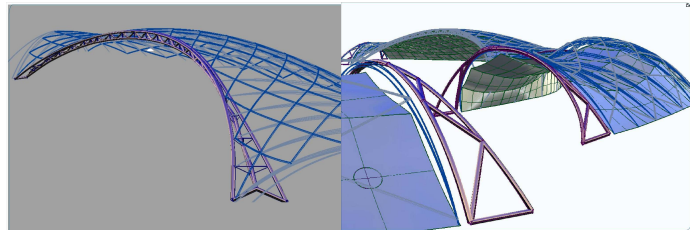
semi-open and close surfaces supported by trussed arches, (left) the storage room with frontal face open, with supporting truss at the front (right) fitting room, with lateral supporting trusses.
